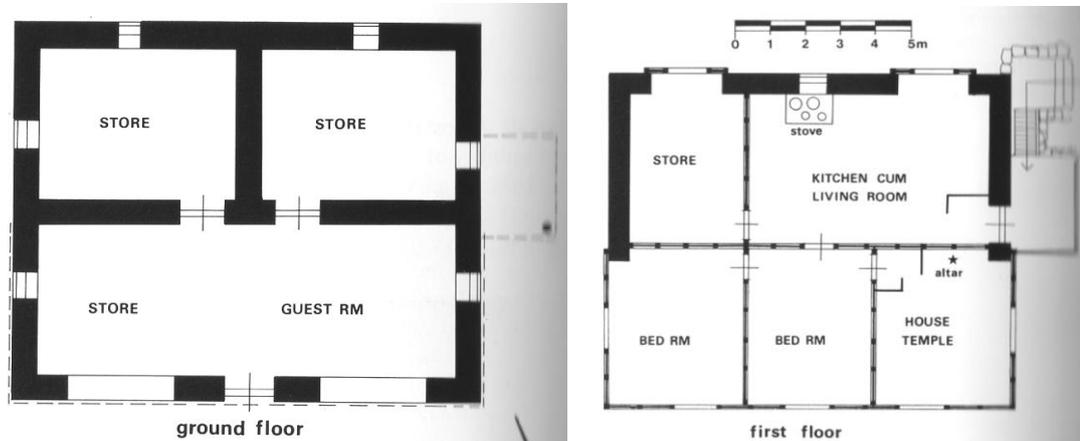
Plans of Traditional Farm House (Ground and First Floors) ,*Source:* [11].
